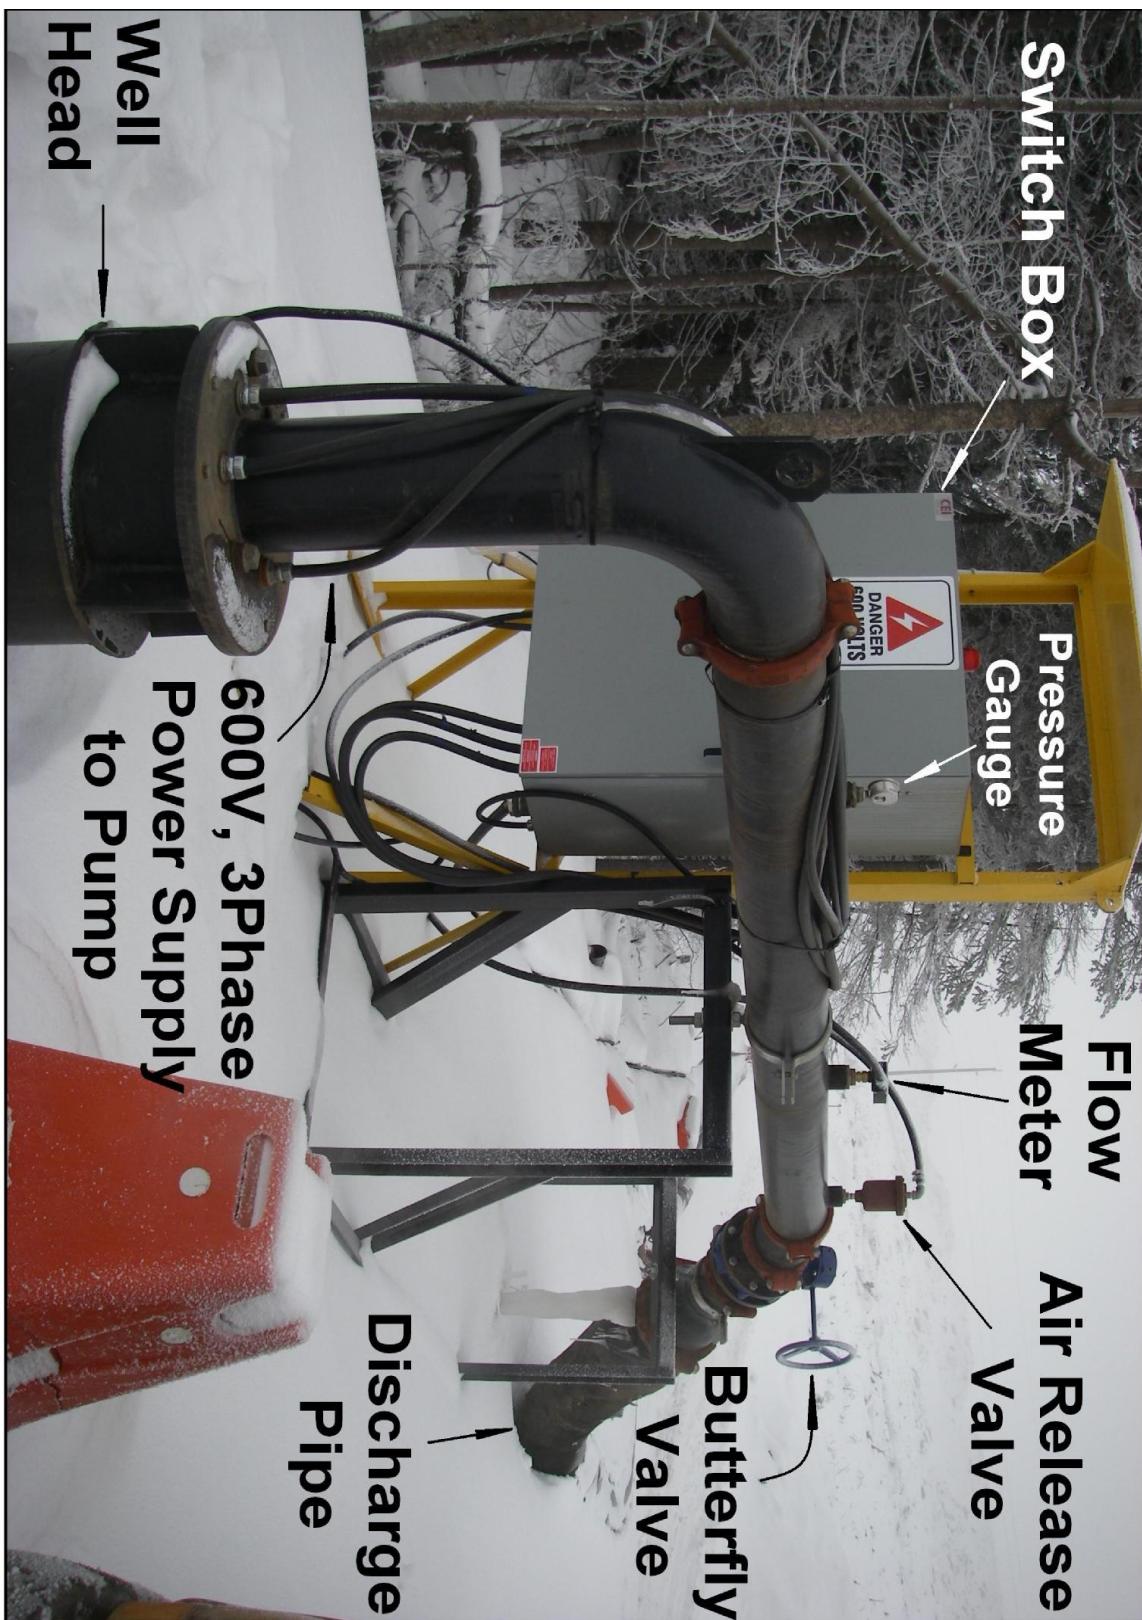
Typical Layout for a Groundwater Extraction Site
